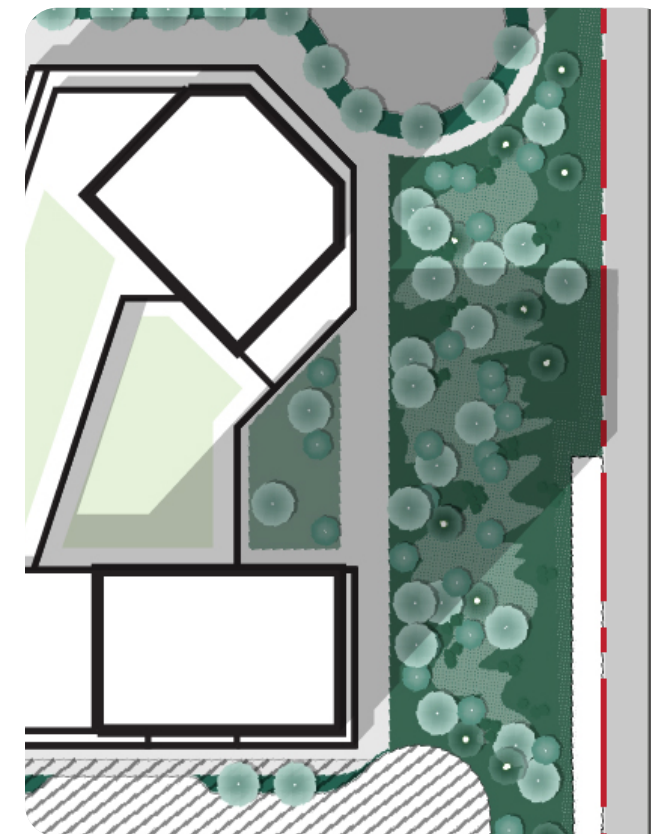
Bio Corridor Anchor Concept Landscape Plan.
